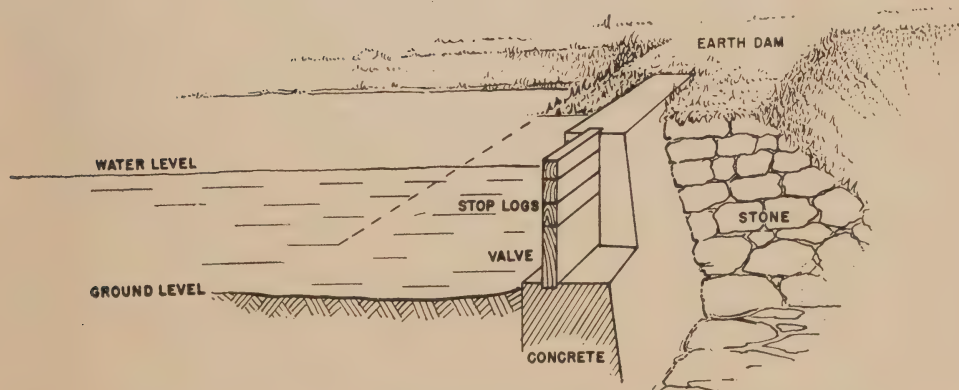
A section through the concrete structure. It should be noted that the floor of this section of the dam is level with the bottom of the pond. The concrete is set well back into the earth dam and must go deep enough into the stream bed that it will have a firm base and not allow water to leak under it and will not heave with the frost. The stop logs may be removed in anticipation of very heavy flows. If the spillway section with logs removed is as large as the stream channel which feeds the pond, no water should go over the earth structure of the dam.
